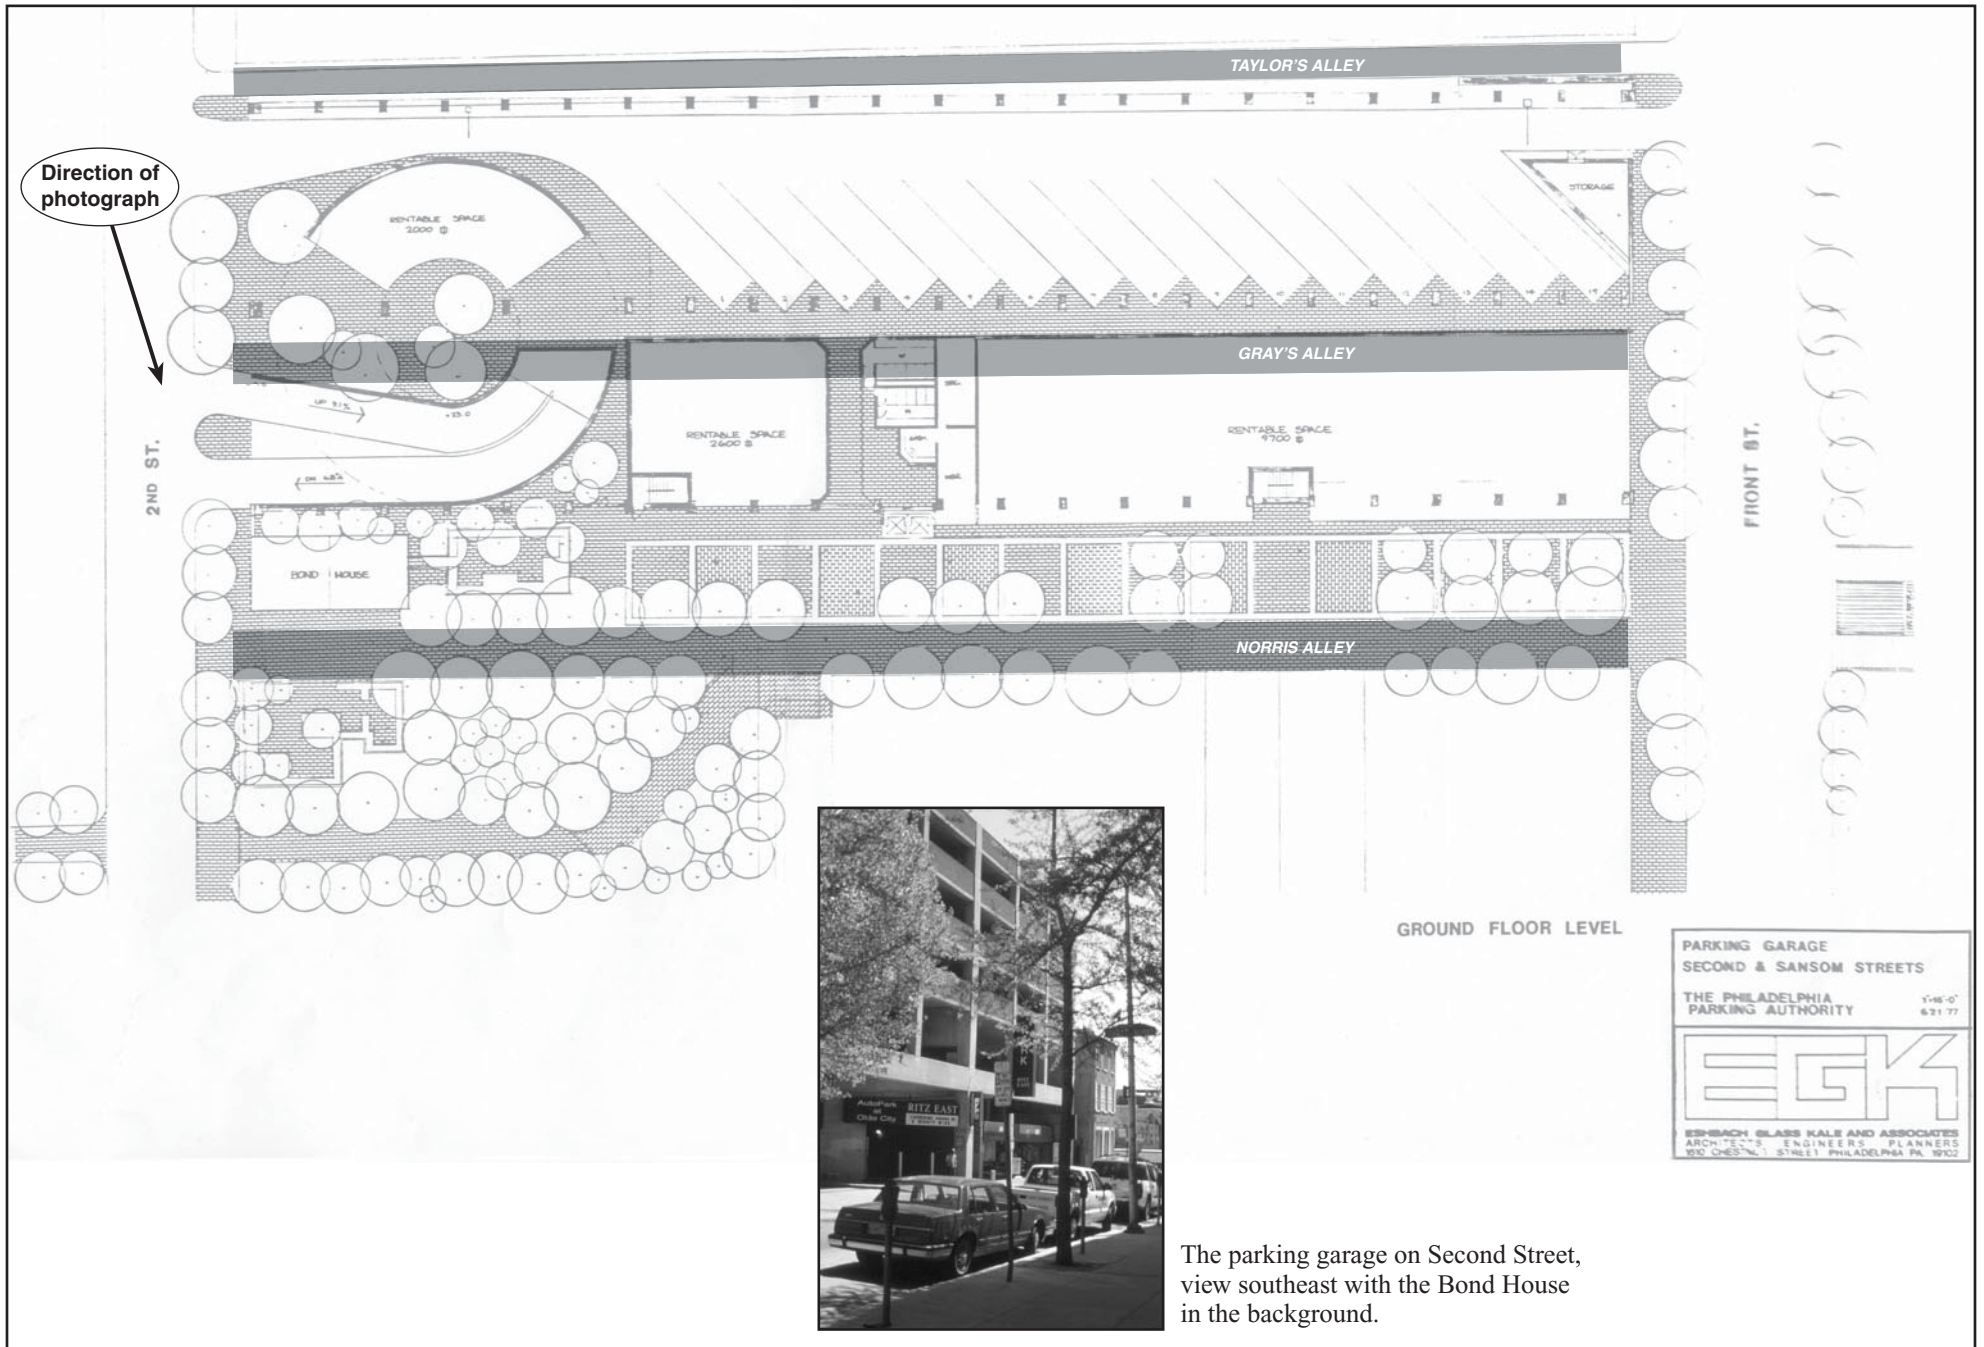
The Area F site as it appears today beneath the parking garage. The locations of Norris Alley, Gray's Alley, and Taylor's Alley have been added to the construction plan for orientation.
